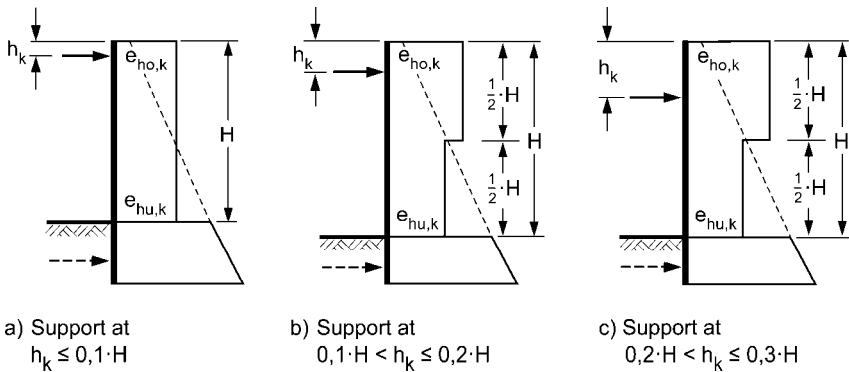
Pressure diagrams for single-propped sheet pile walls and in-situ concrete walls
